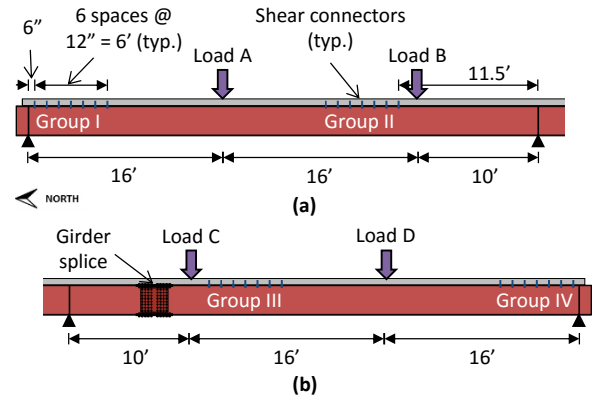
Elevation View of Test Specimen – (a) North Span and (b) South Span
